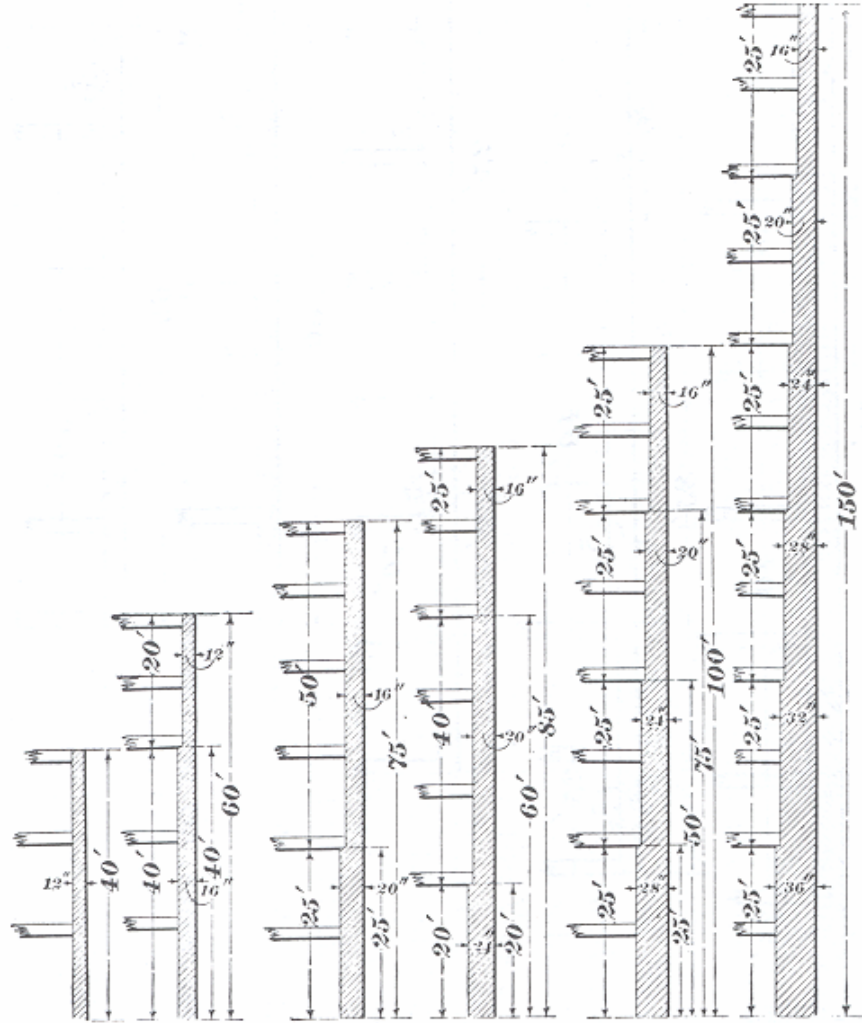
Standard thicknesses of masonry walls for warehouses and factories per the building law of New York (figure taken from Lavica 1980)
